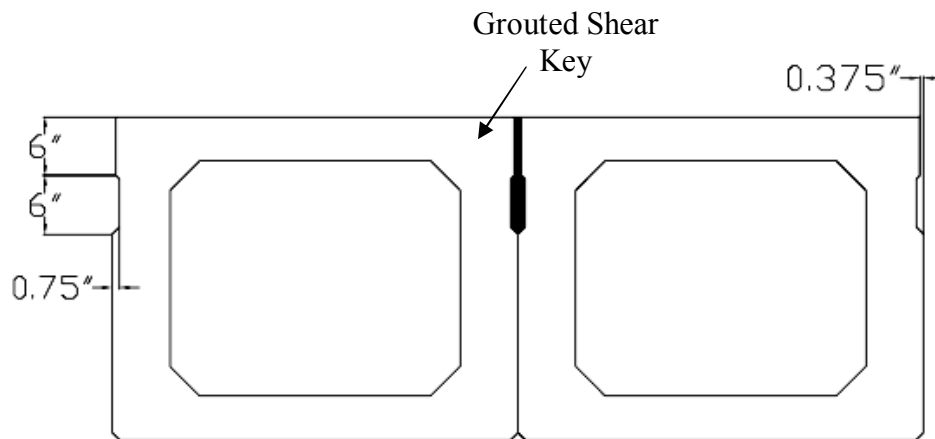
Typical geometry of a shear key used in a box girder system (Huckelbridge, Jr. et al., 1995)
